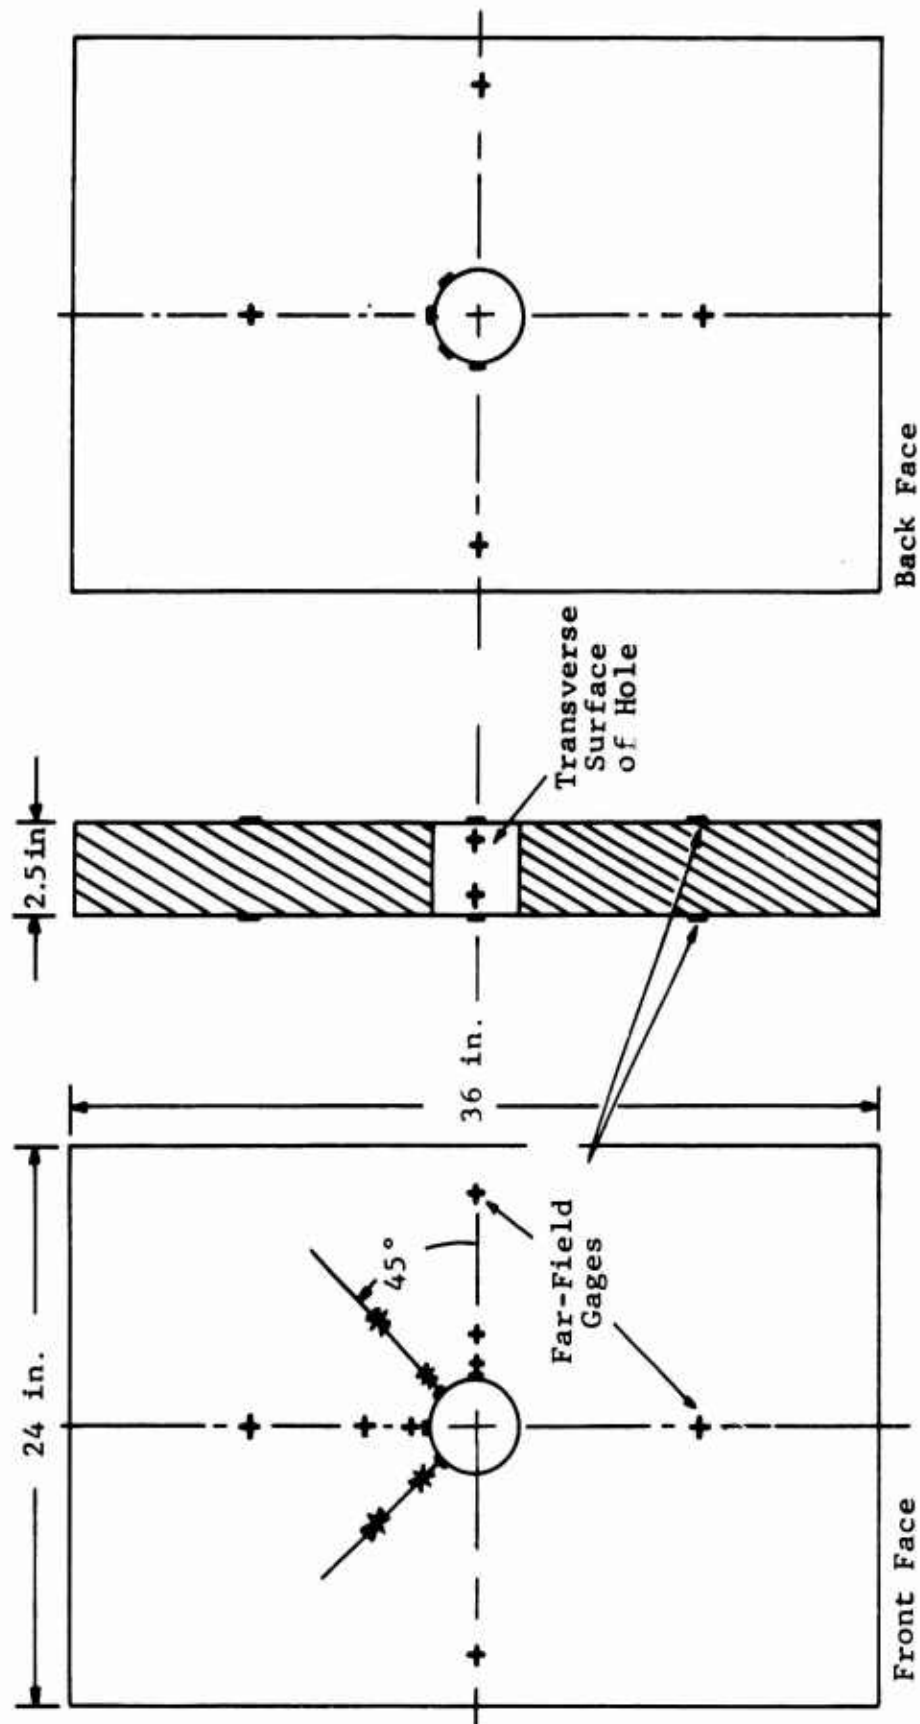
STRAIN GAGE LAYOUT FOR SPECIMEN NO. 1 (UNLINED LIMESTONE UNDER UNIAXIAL LOADING)
